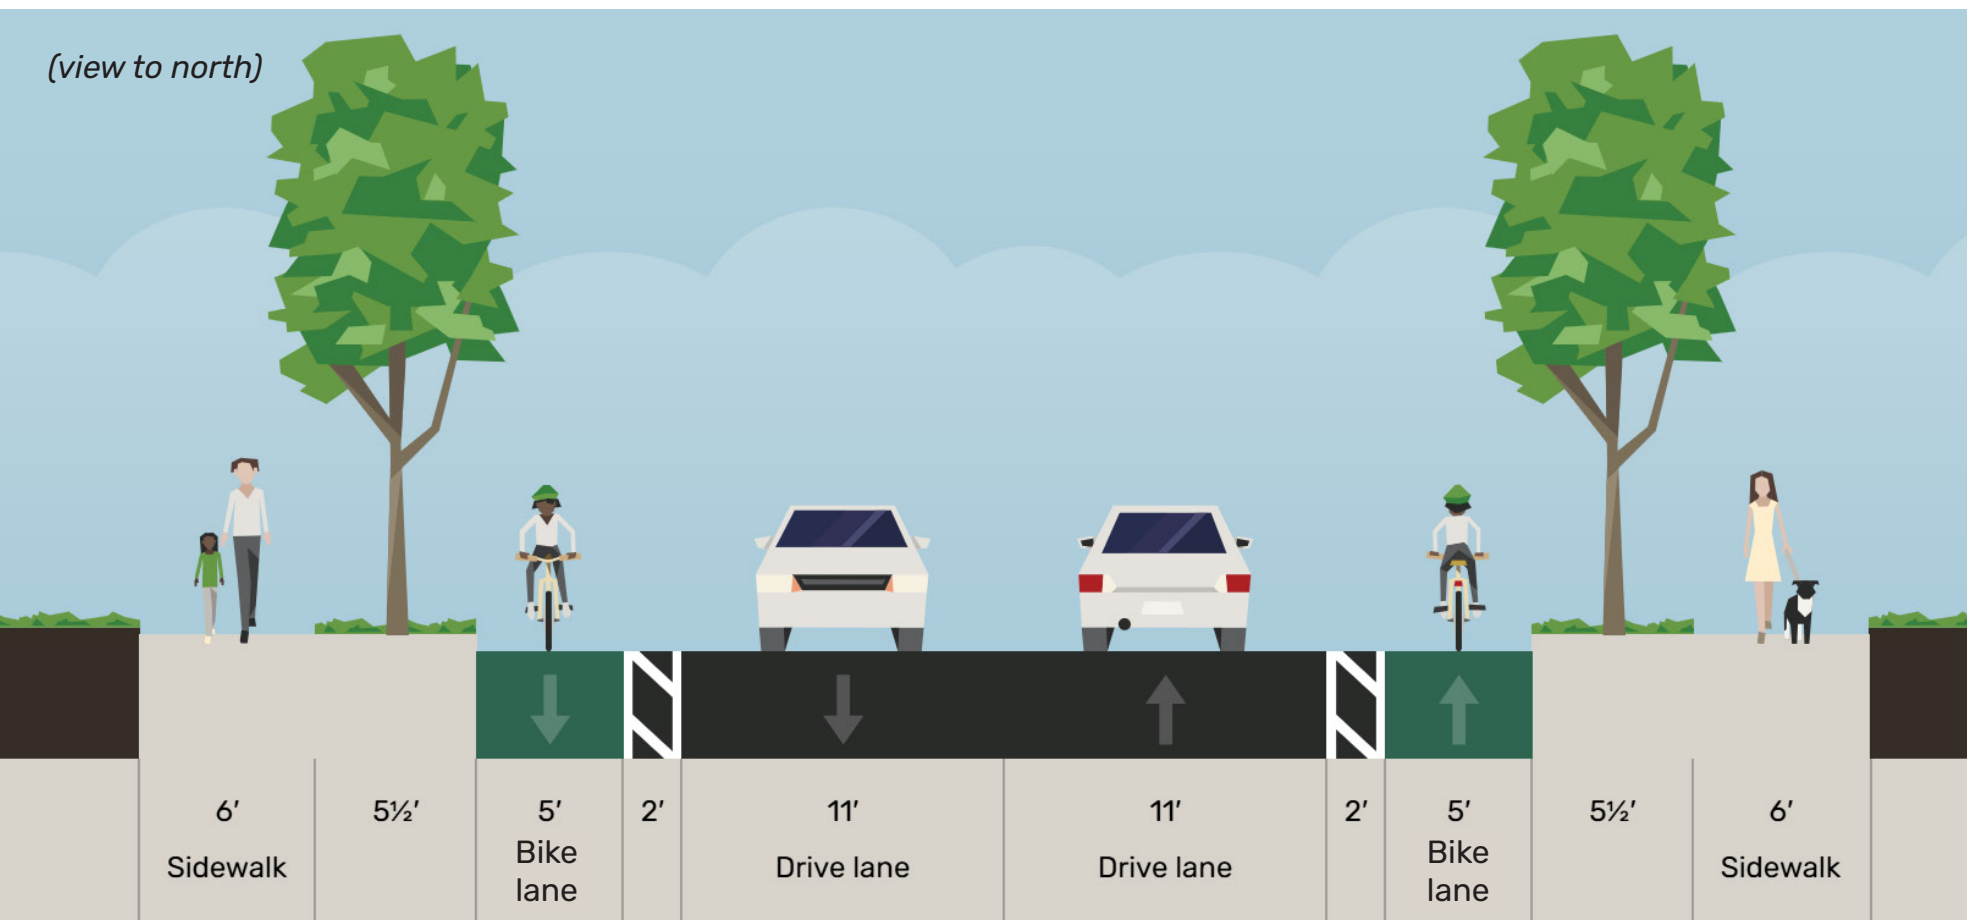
Proposed Typical Cross-Section on Oakmont Drive (60' ROW)
